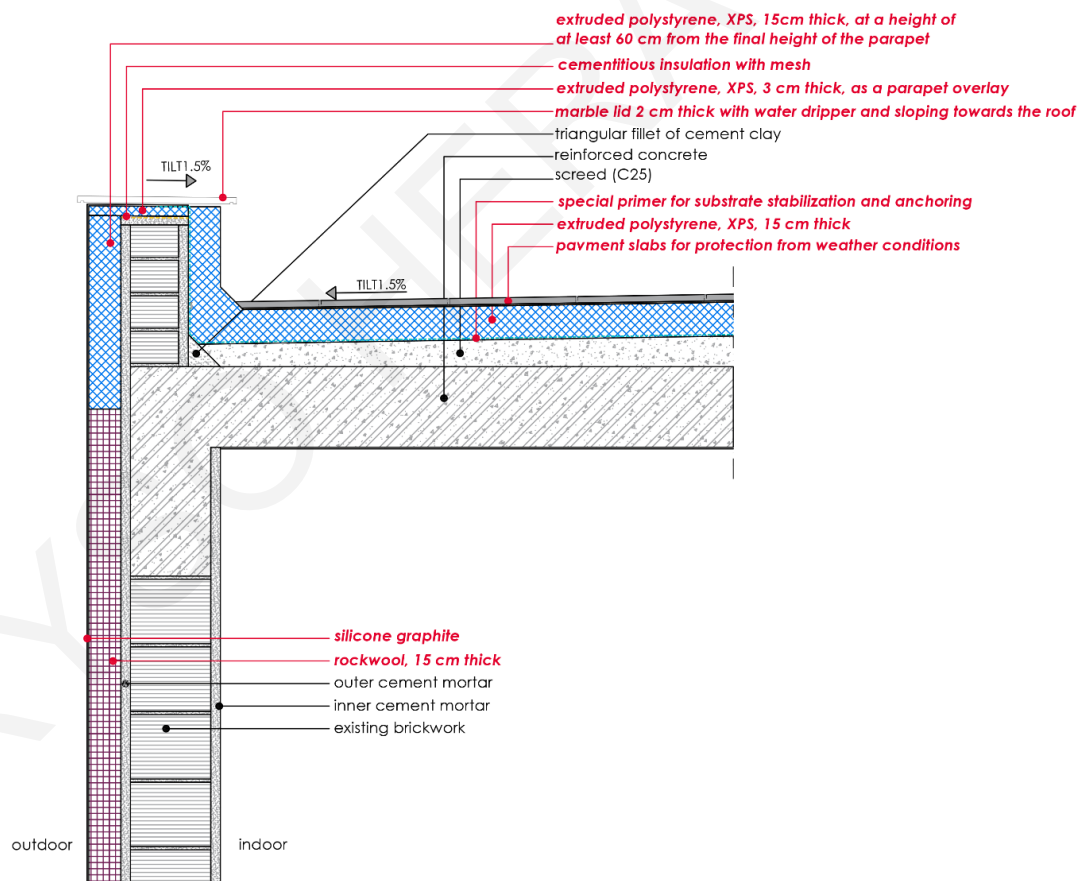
Construction detail of wall and roof insulation (Case 26).
